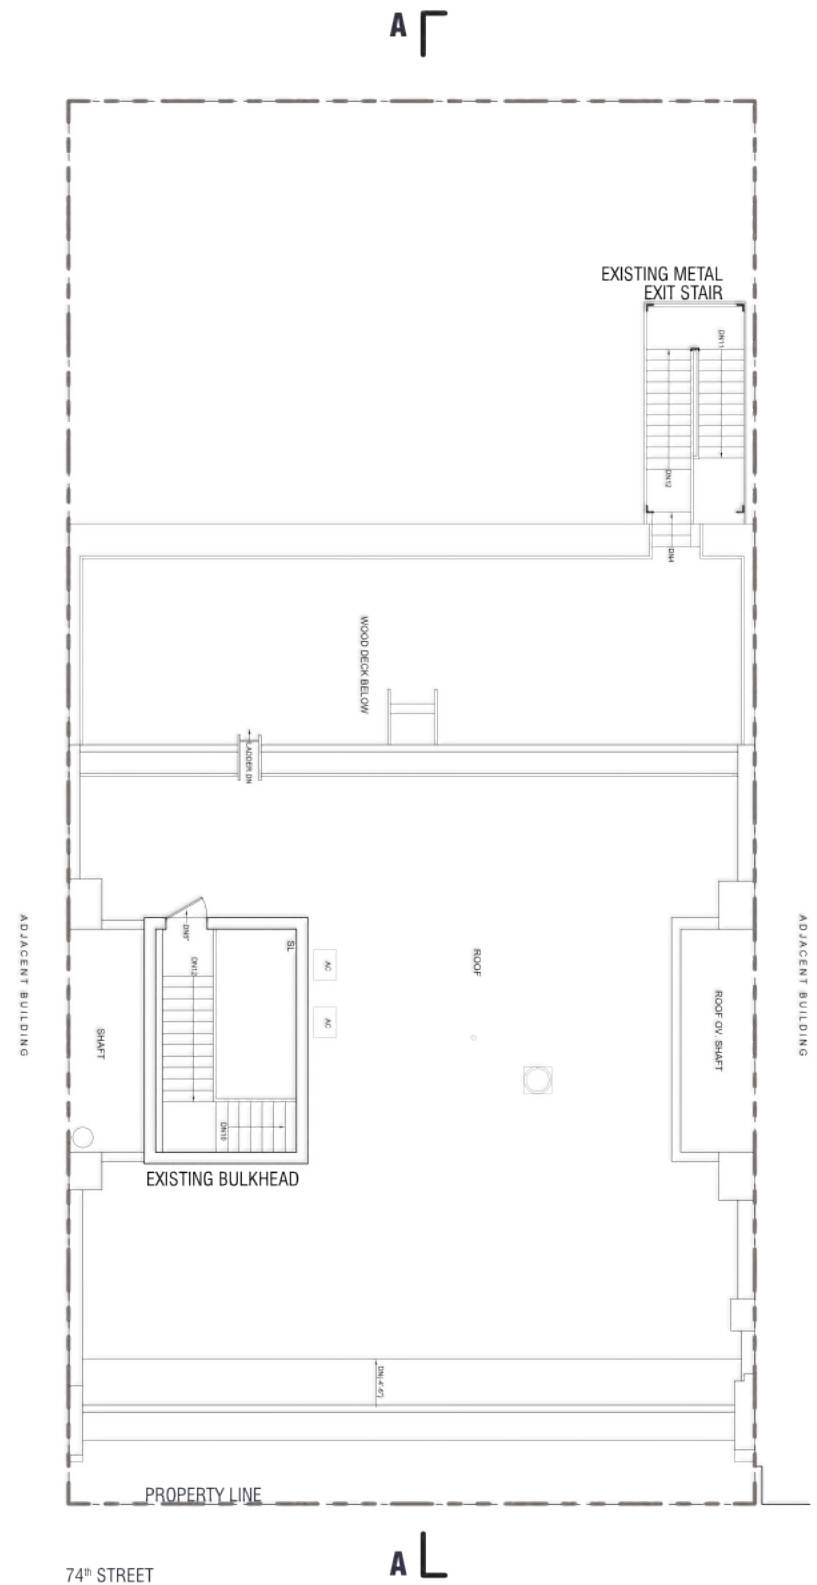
EXISTING BUILDING ROOF TOP BIRDS EYE VIEW SOUTH
